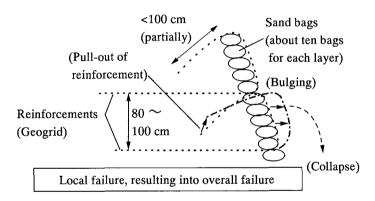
Schematic figure on damage to wrapped-around type reinforced-soil embankments
